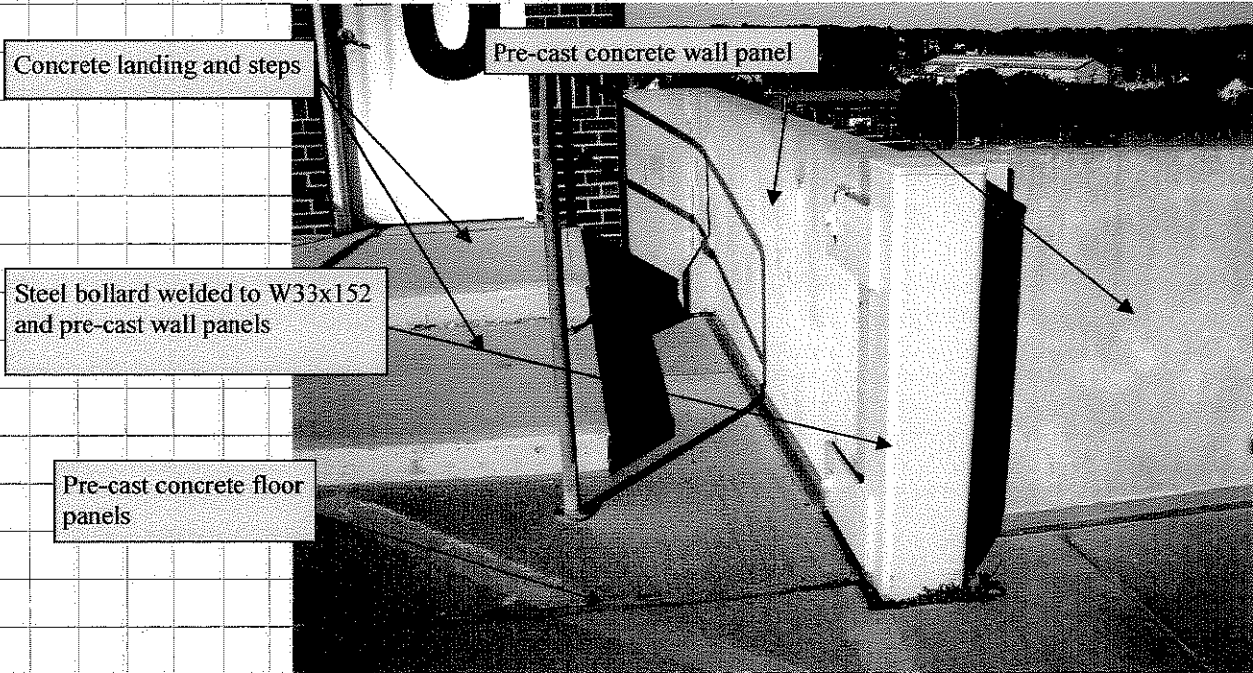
Pre-cast concrete wall to pre-cast concrete floor panel
